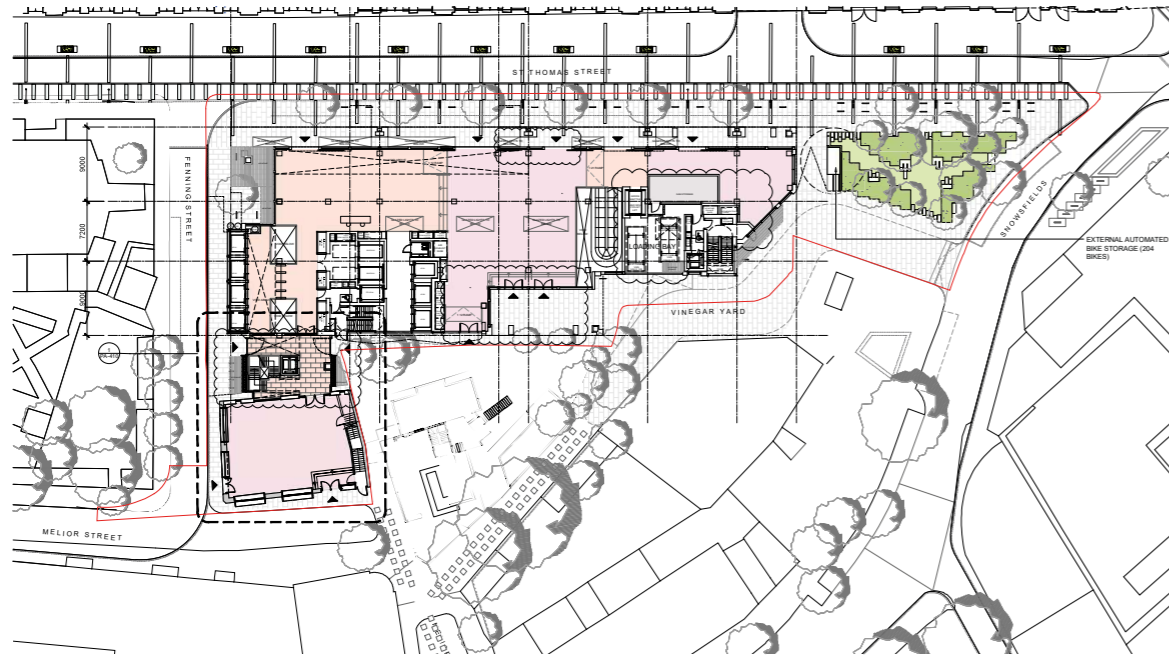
Vinegar Yard, Proposed Ground Floor Layout (D1)
